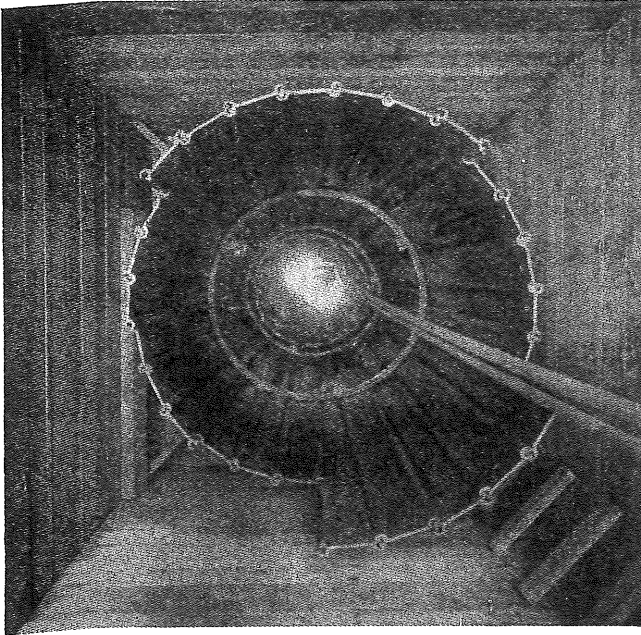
SHEET STEEL PILES DRIVEN TO FORM A CYLINDER.
